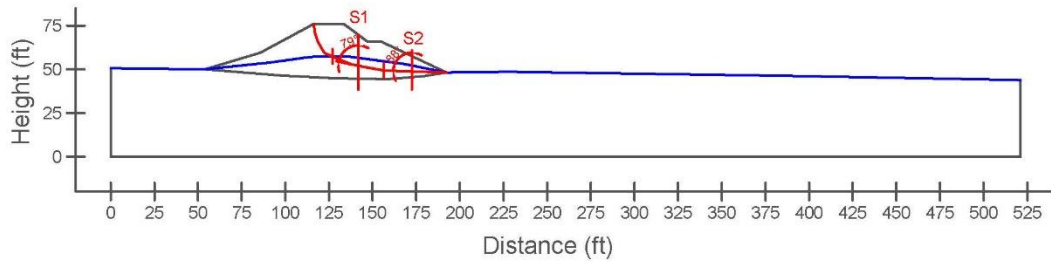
Sub-sectioning of the cross-section and failure plane for Uetsu Railway Embankment
